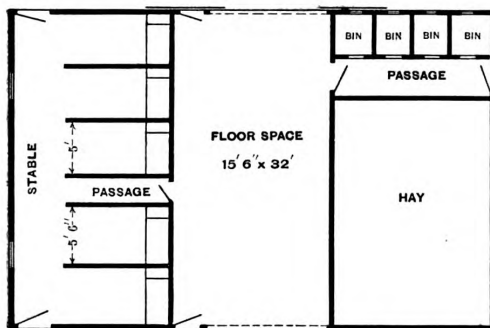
Floor Plan of Barn.—Scale, 1-16 Inch to the Foot.
